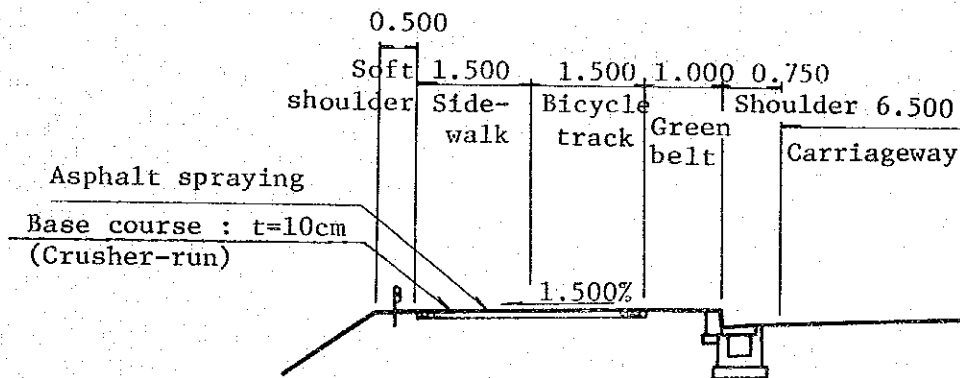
Pavement Structure of Sidewalk/Bicycle Track in Embanked Section
